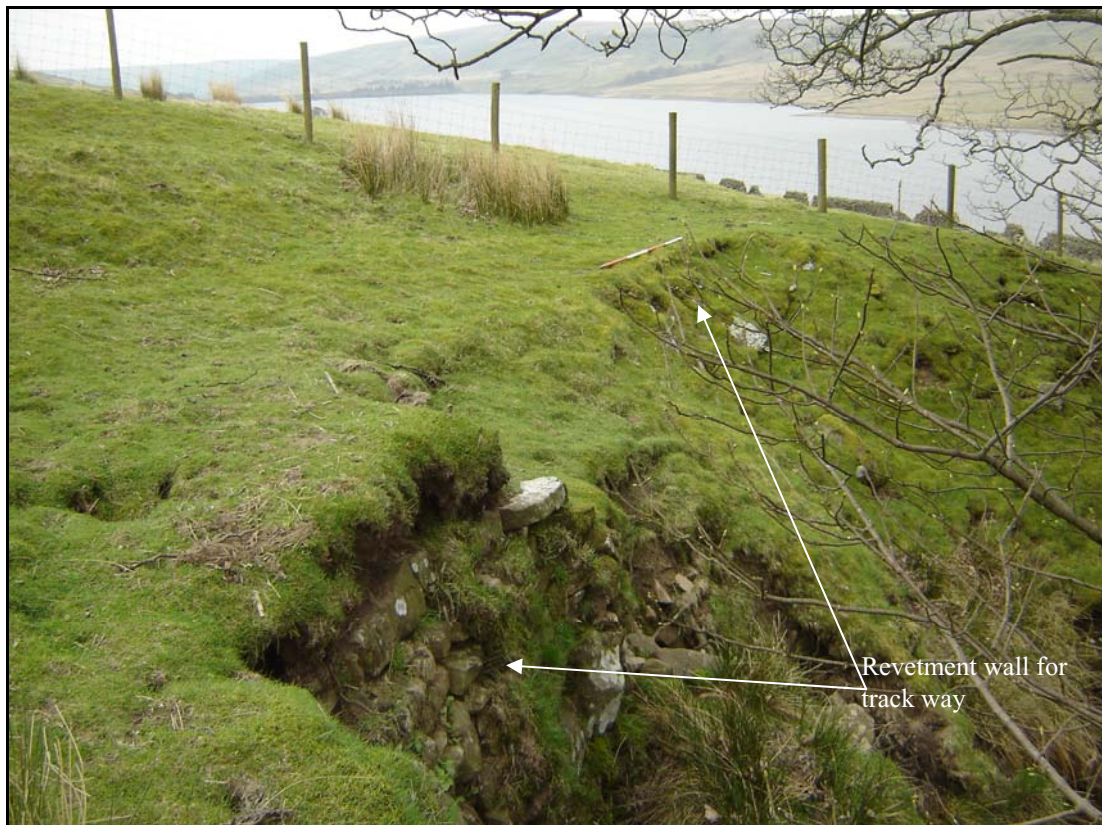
Trackway to Haden Carr crossing Stand Sike stream, looking SE, scale 2m
